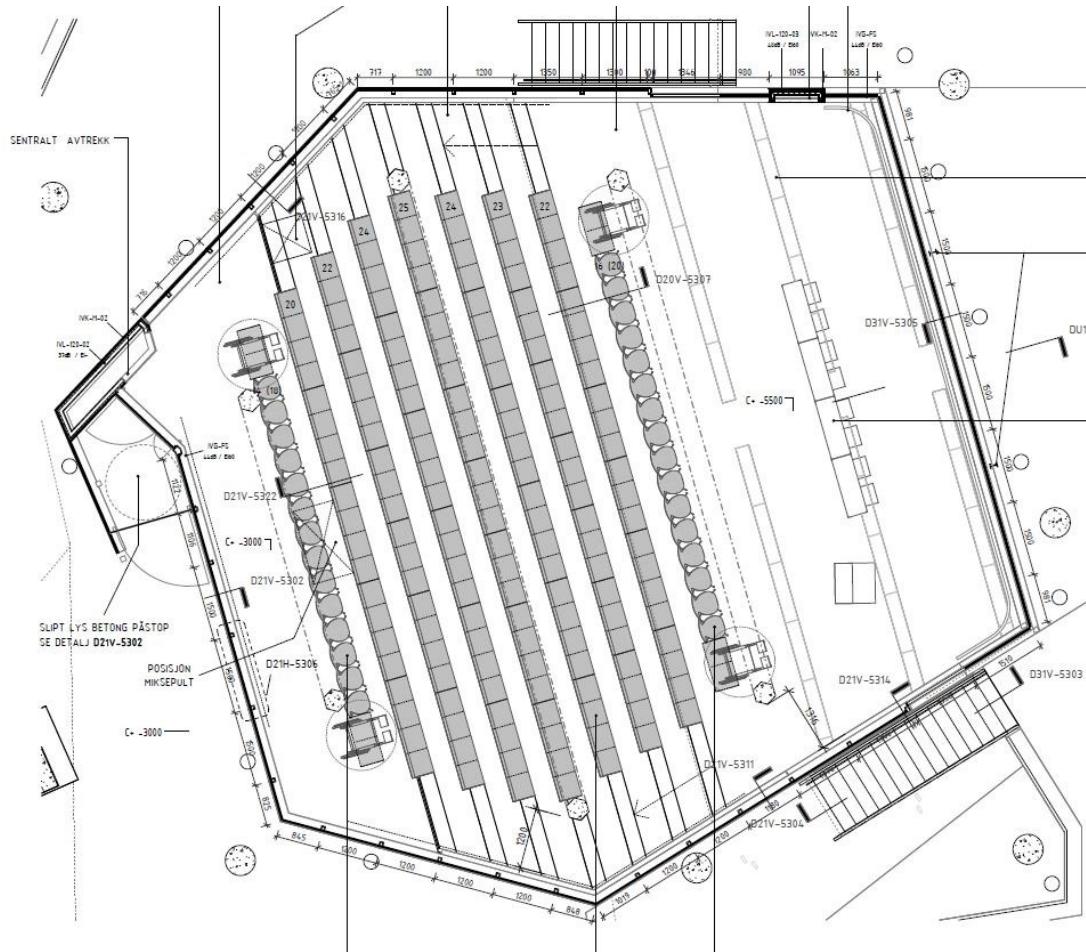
Floor plan of the hall in the new library (Courtesy of Lund Hagem architects)
